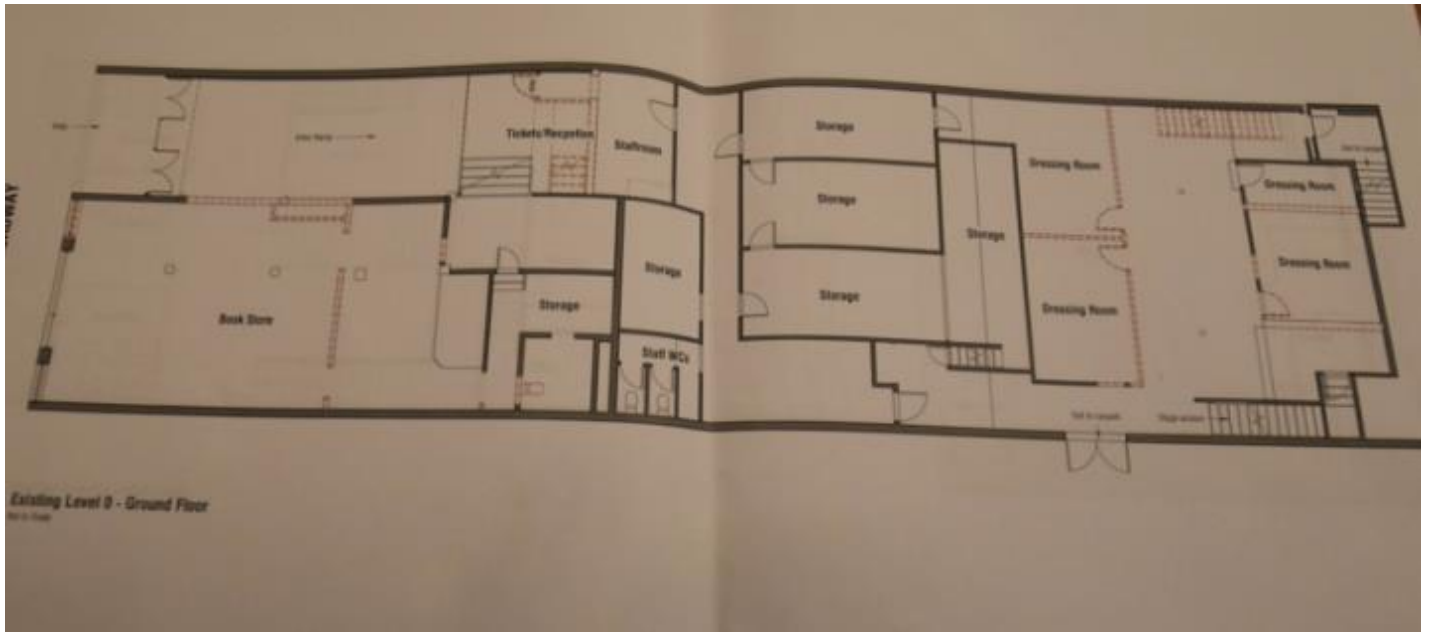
Ground floor. Boon Team Architects, 2018. Stratford District Theatre Trust collection.
